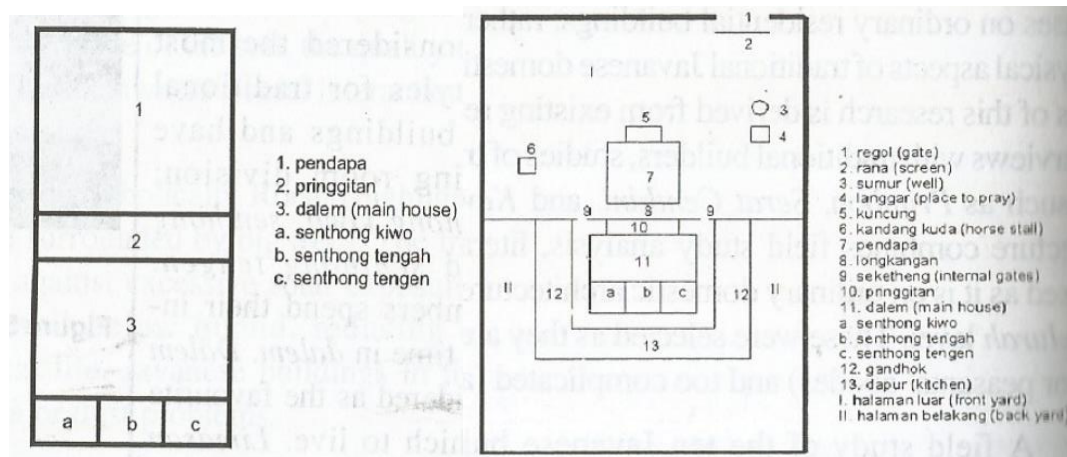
Overall house compound layout and basic floor plan of a typical traditional Javanese house (Source: Satwiko 2004)
